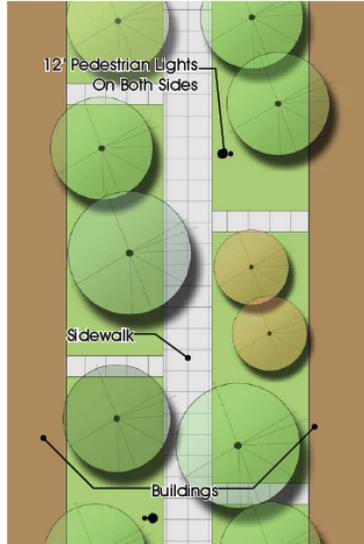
PASEO TYPICAL PLAN (PROTOTYPE)
